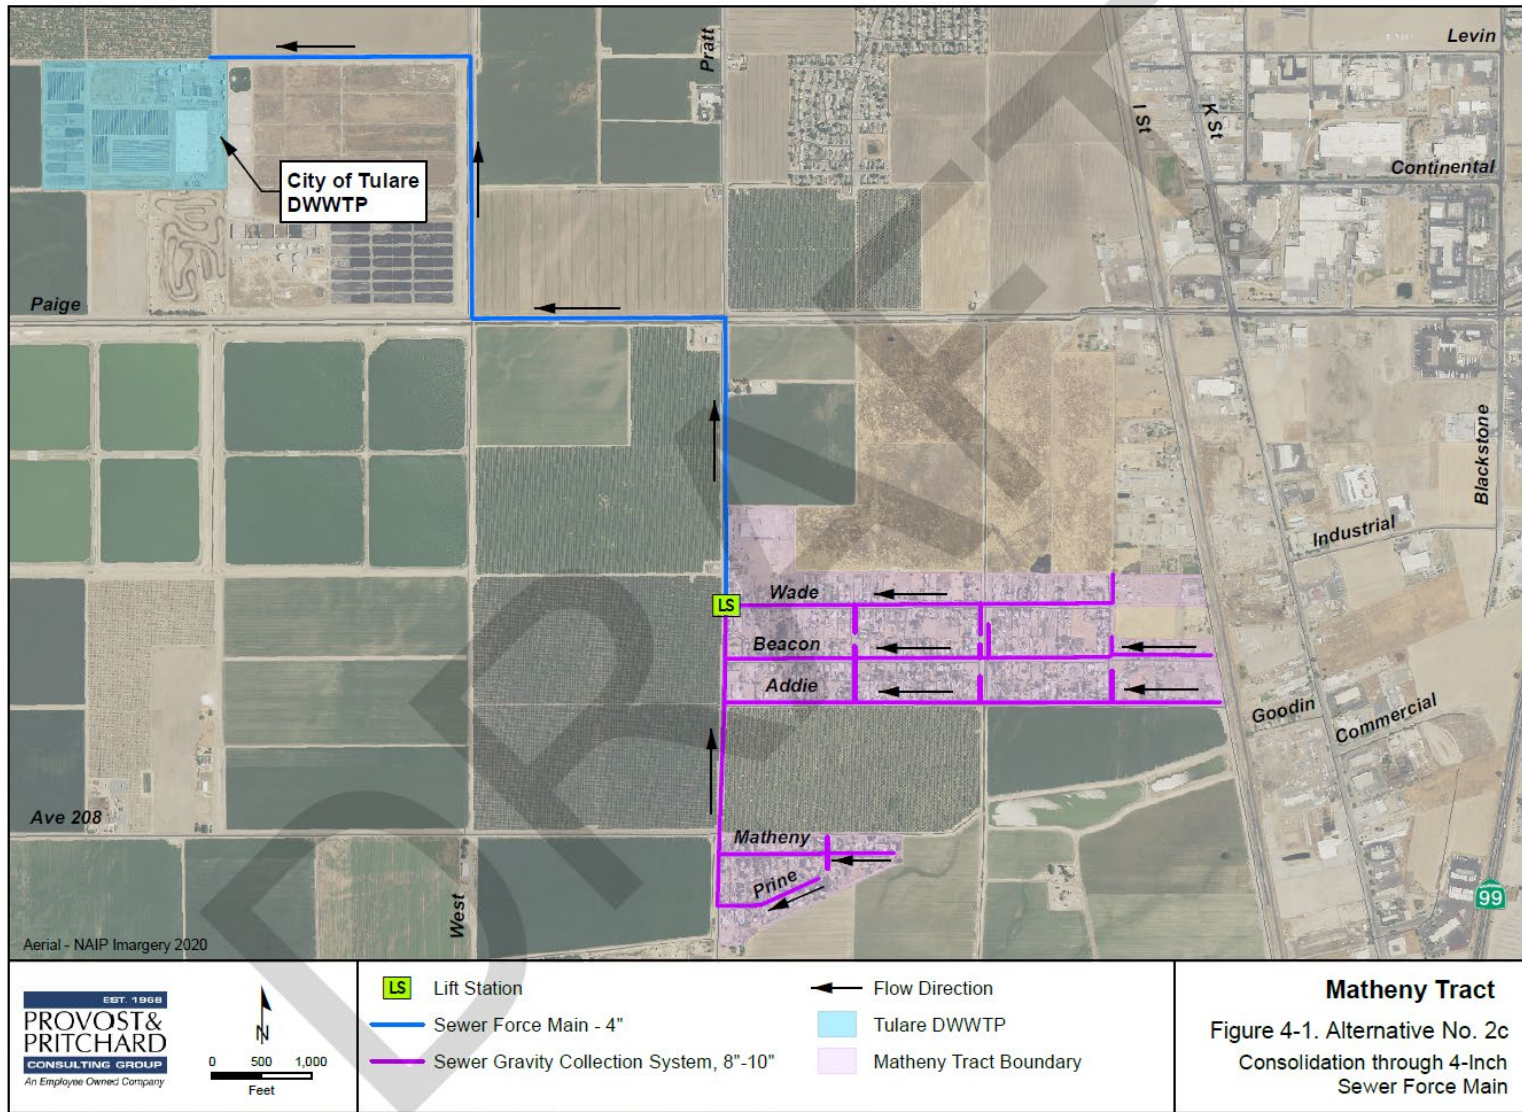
Matheny Tract Wastewater Pipeline Project Site Plan
